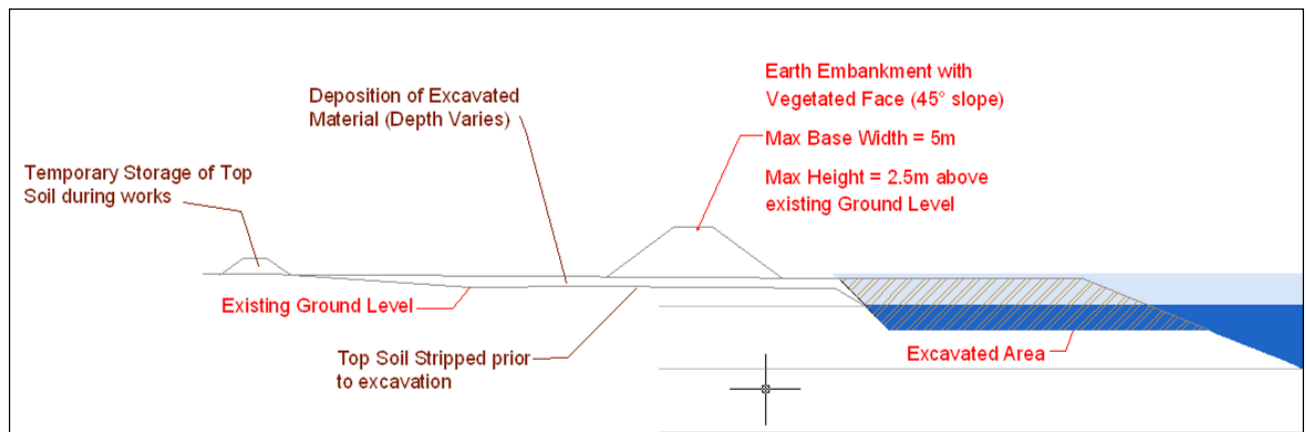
Typical Detail of the Proposed Bank Side Spoil Heaps
